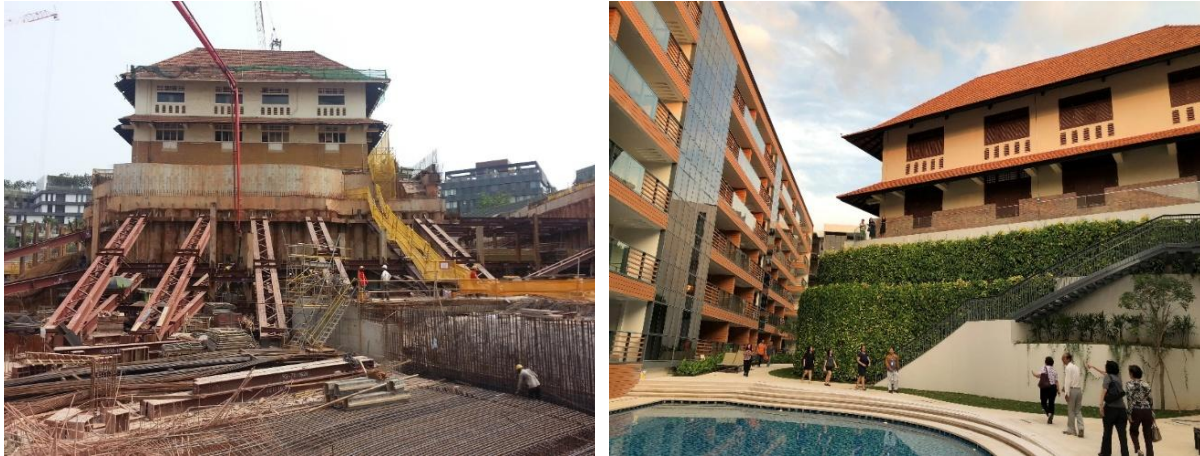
Site condition of the former Olson Building during construction (left) and after construction (right)
